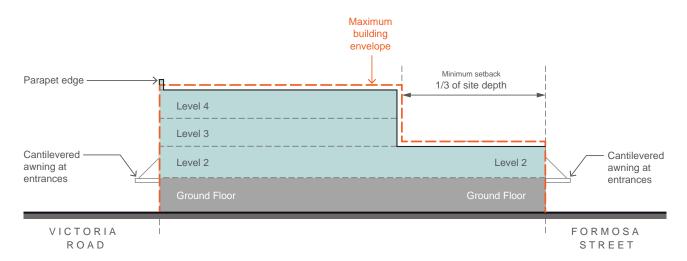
Victoria Road Drummoyne Area C - Maximum Building Envelope Section
